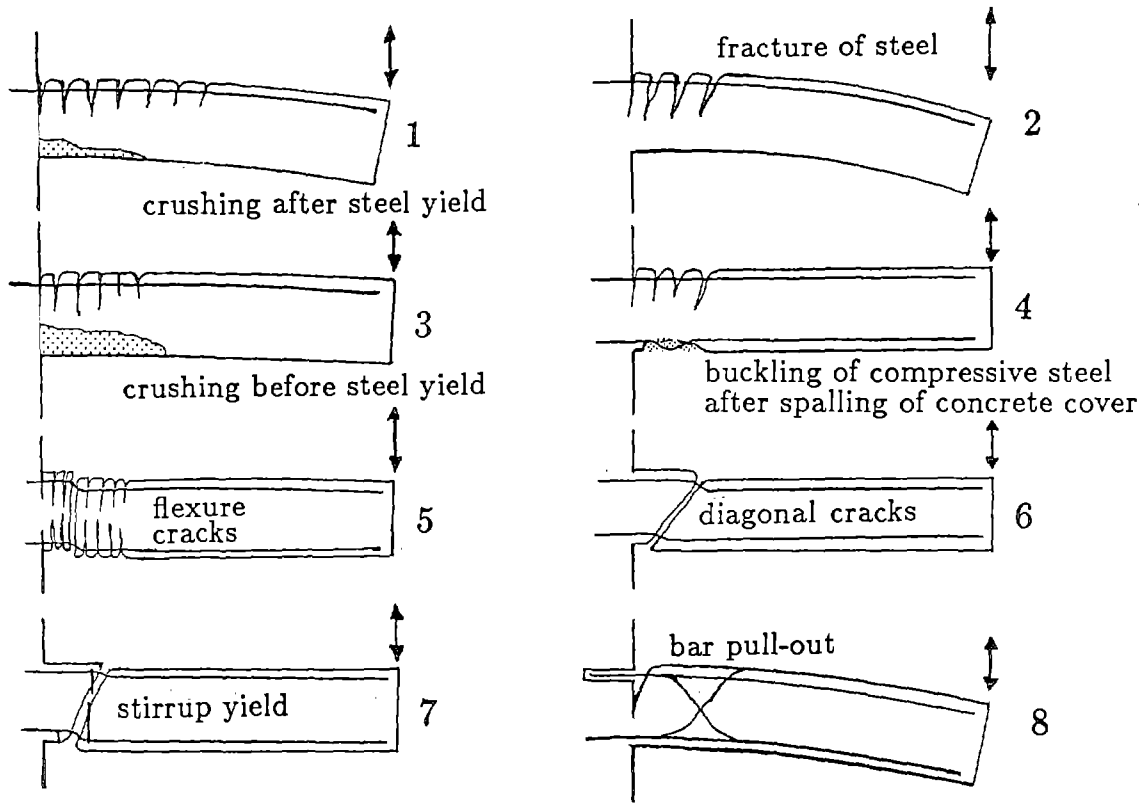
Possible failure modes of reinforced concrete members
